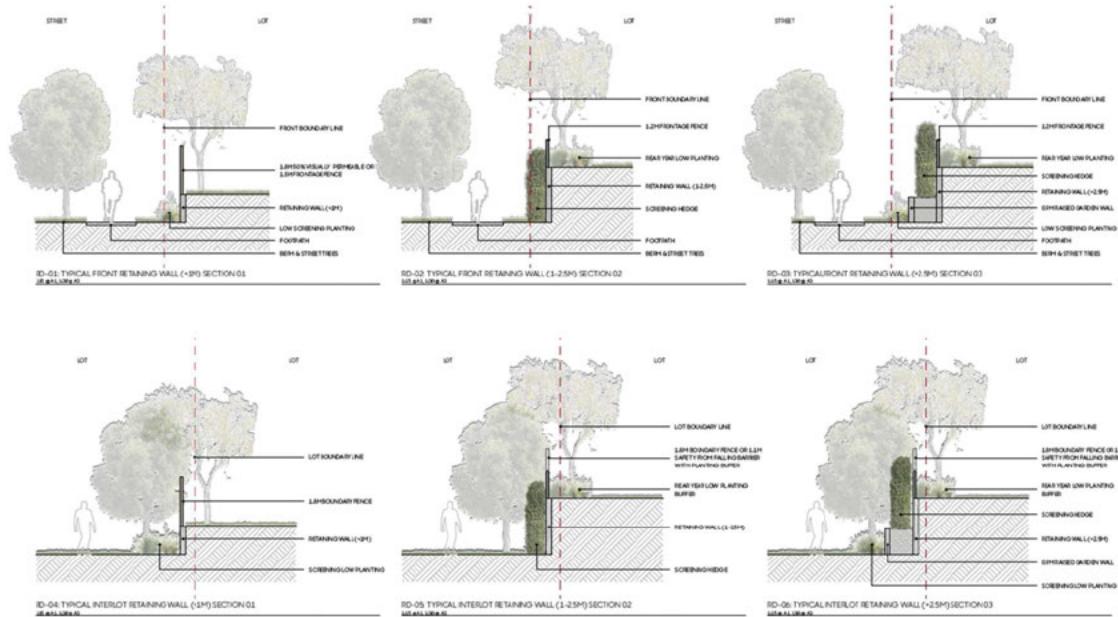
Extract from Greenwoods landscape plans highlighting the treatment of retaining walls that are less than 1m, between 1m - 2.5m, and greater than 2.5m.
